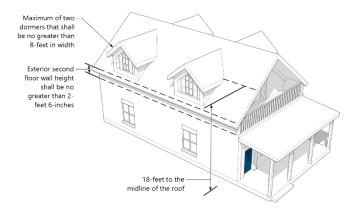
Example of a Second Story Contained Within a Pitched Roofline with Two Side Dormers
